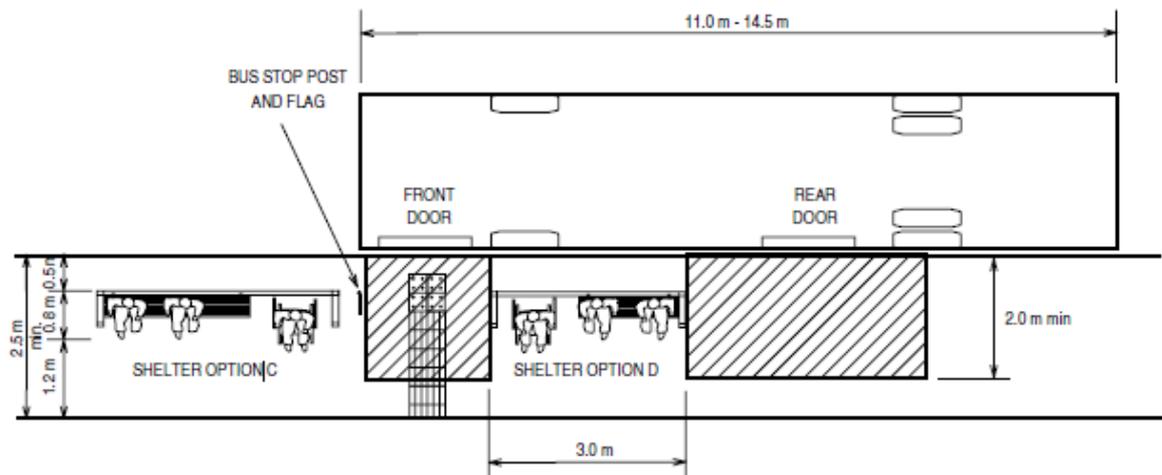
Bus passenger shelter location options C and D – roadside width >2.5 m
